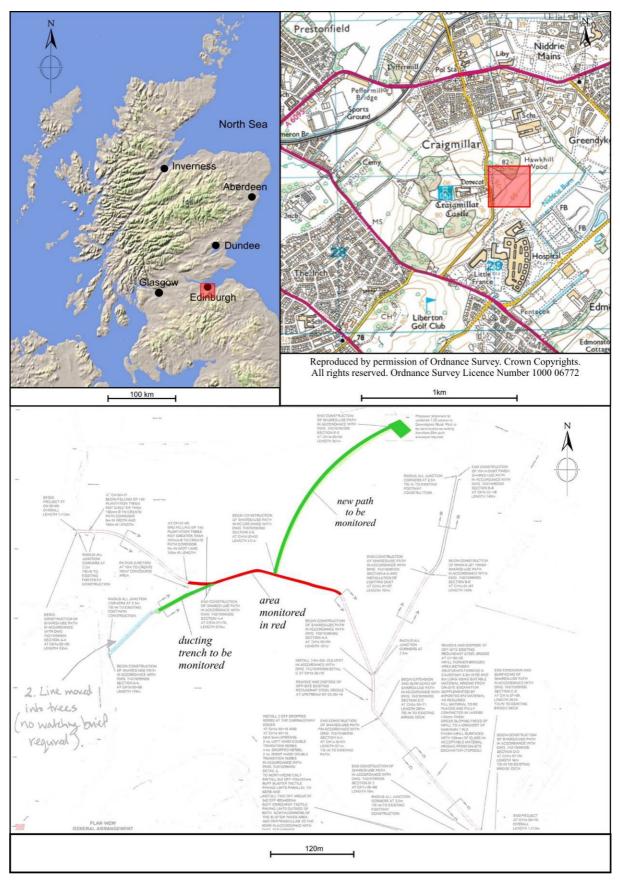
WSI – Appendix H- Altered Site location plan (trenching already monitored in red, new trenching in green).
